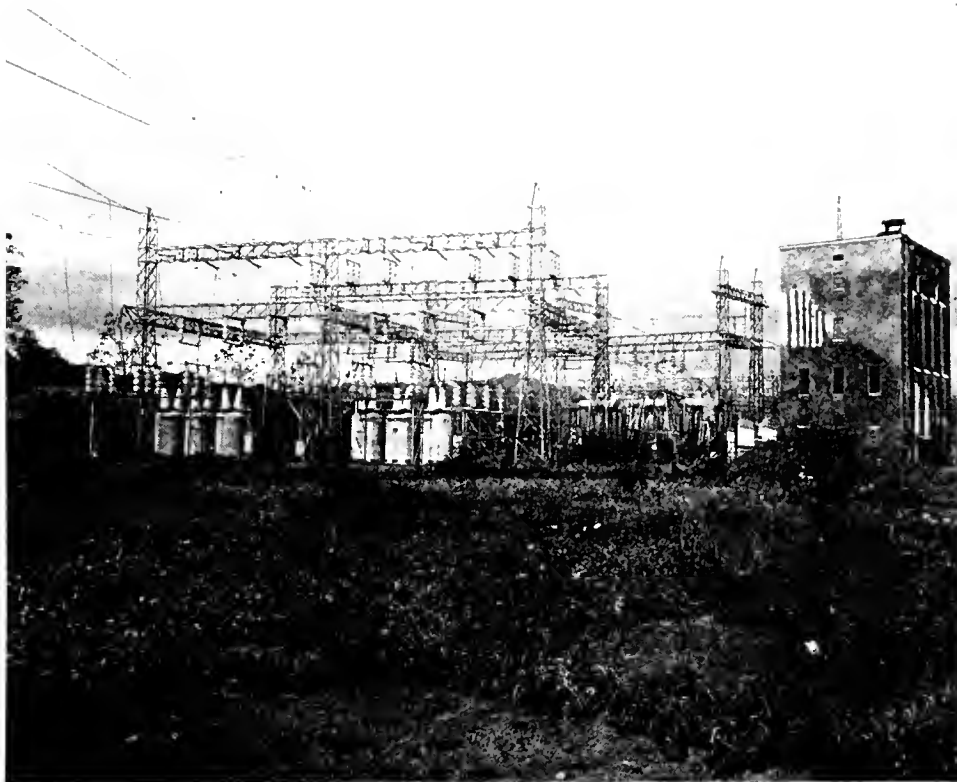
Kawabe Plant—General view outdoor switching and transformer station
